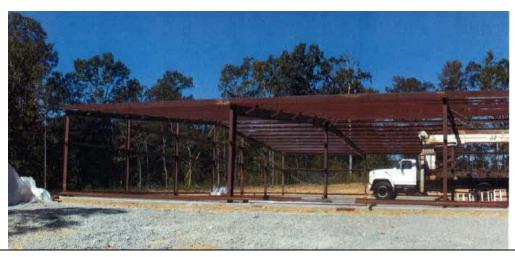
of 1 – Photo shows a view of the steel building where the employees were working the incident occurred.
